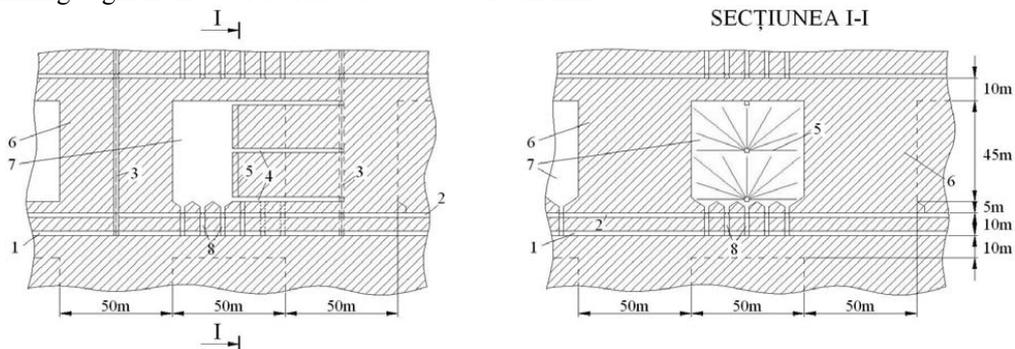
Sublevel stopping, with vertical fan drilling holes mining method
